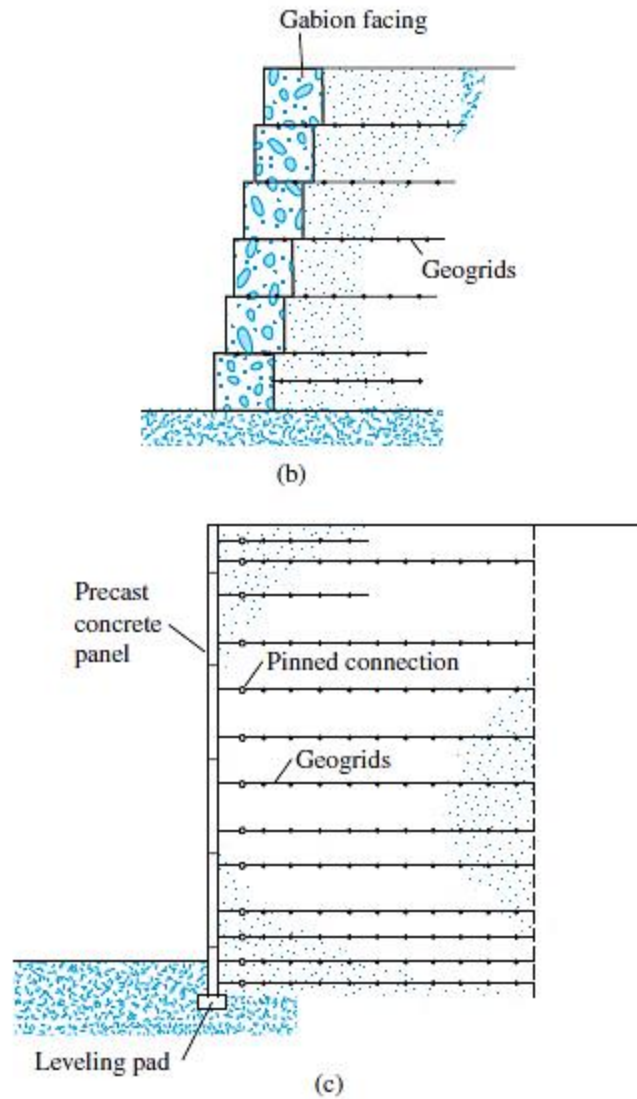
Mechanically stabilized earth walls with geogrid reinforcement: (b) wall with gabion facing; (c) concrete panel-faced wall (Based on Berg et al., 1986) (Das, 2016)
